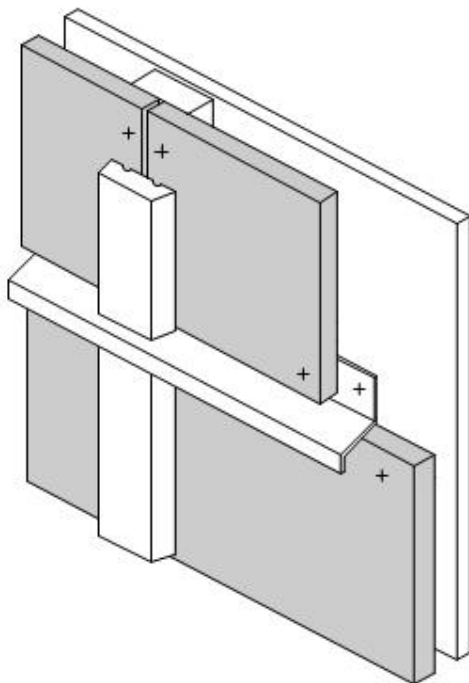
Vertical joint with timber cover battens and horizontal joint with preformed metal flashing
